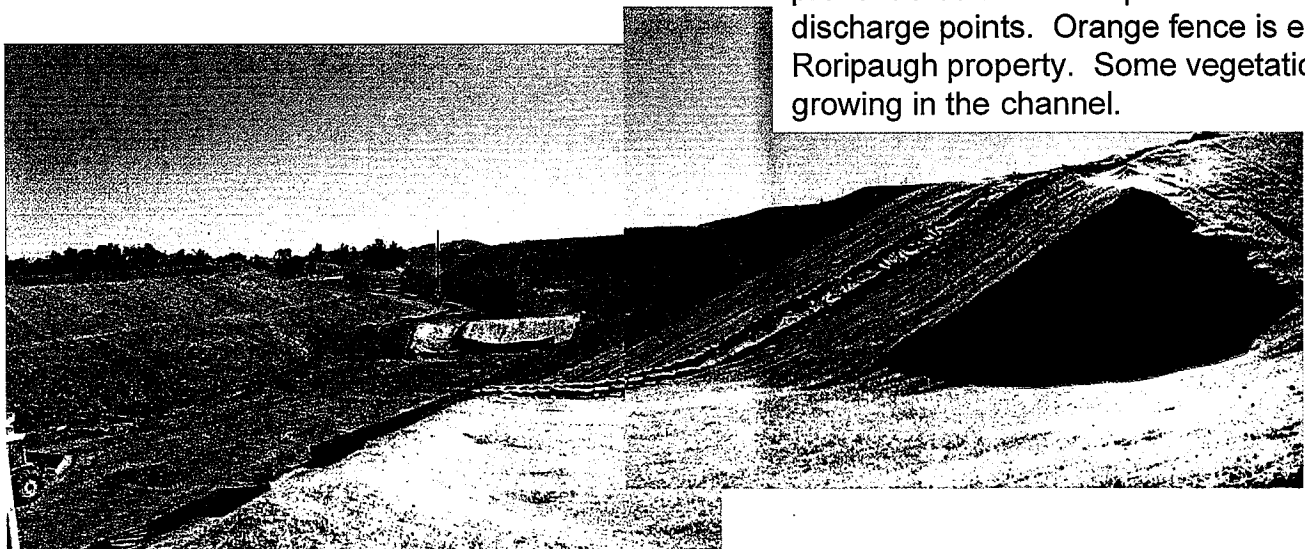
& 8. Loop Road bridge looking upstream. A dike has been constructed in the channel. The dike should be removed. Any concentrated flow spillways should be fully stabilized to prevent erosion at flow paths and discharge points. Orange fence is end of Roripaugh property. Some vegetation is growing in the channel.
